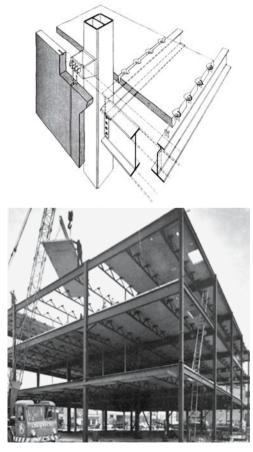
Primary structure of (solid) rolled sections, secondary structure of (open) lattice beams
